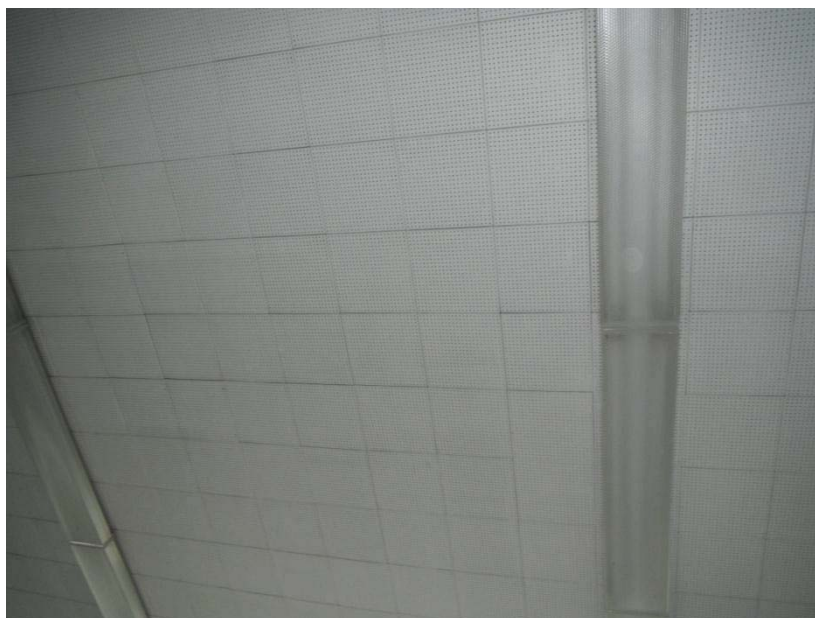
View of Representative Ceiling Tile, 2'x 4', Main Building, Ground Floor Corridor, Sample Set: CT-4-X.
